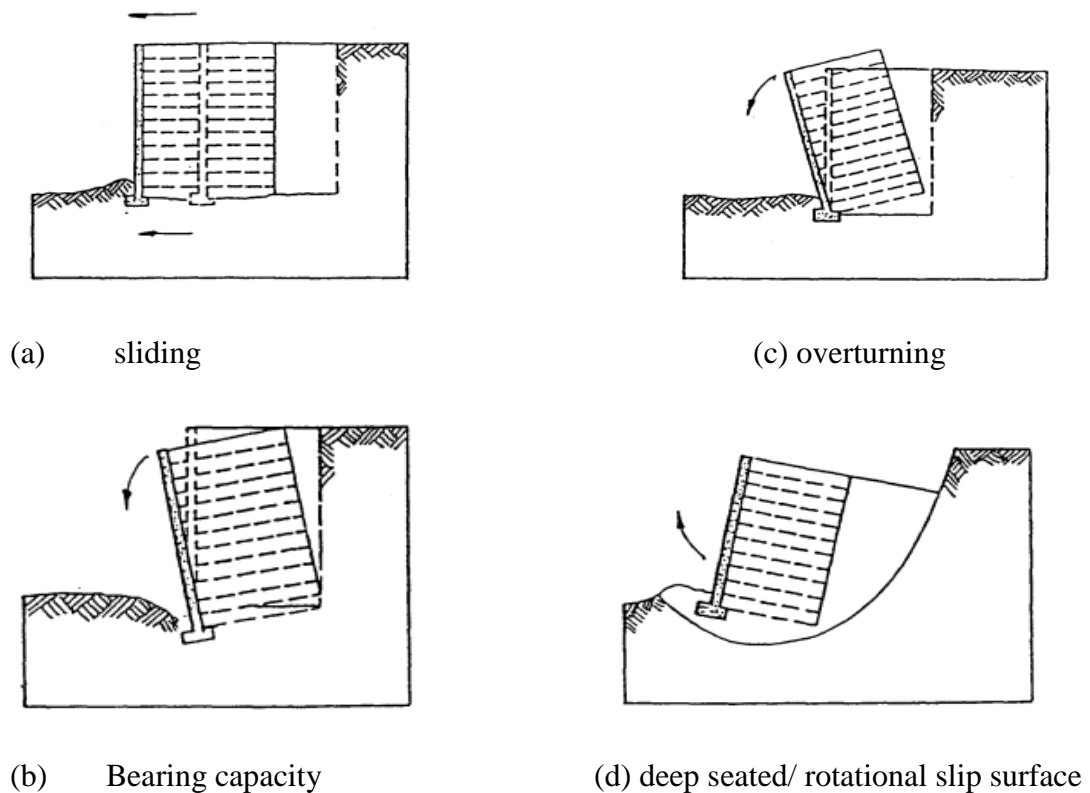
9 External Failures of GRS Walls (FHWA 1990)
